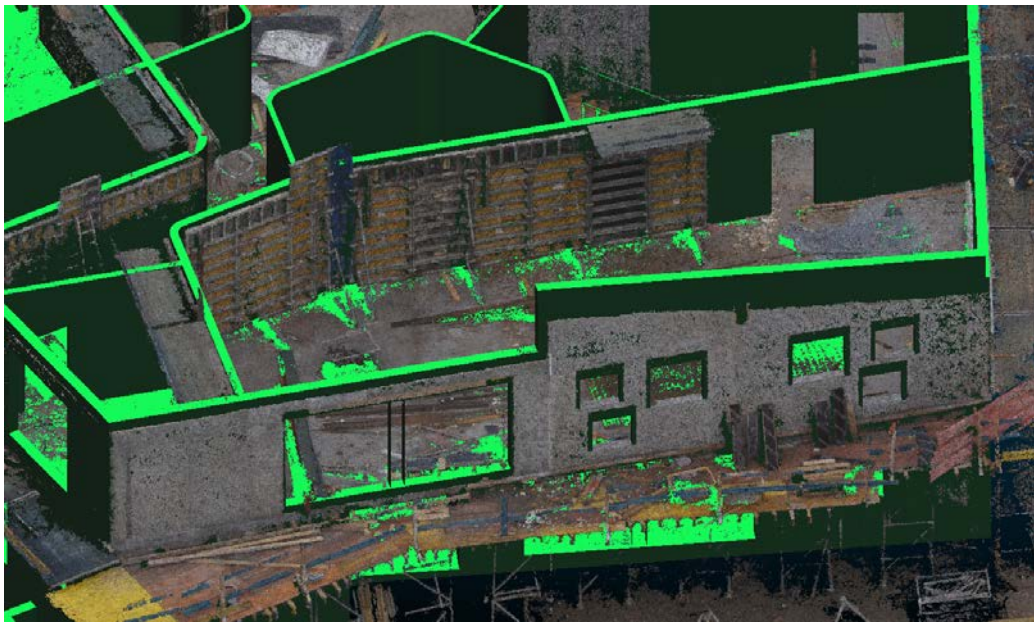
Point cloud of a finished, plain wall and formwork overlaid with the corresponding 3D geometry on Test Site B
